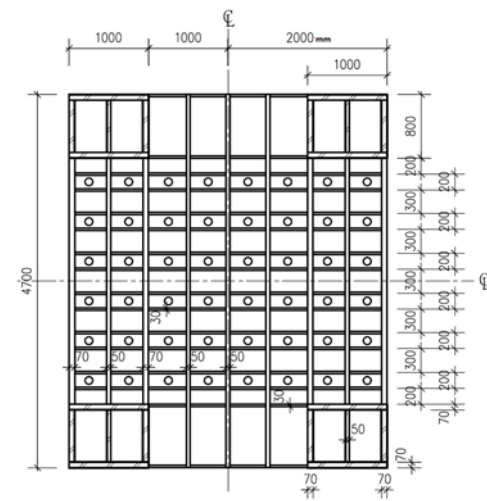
Structural framing plans of the steel reaction frame (top beam).
